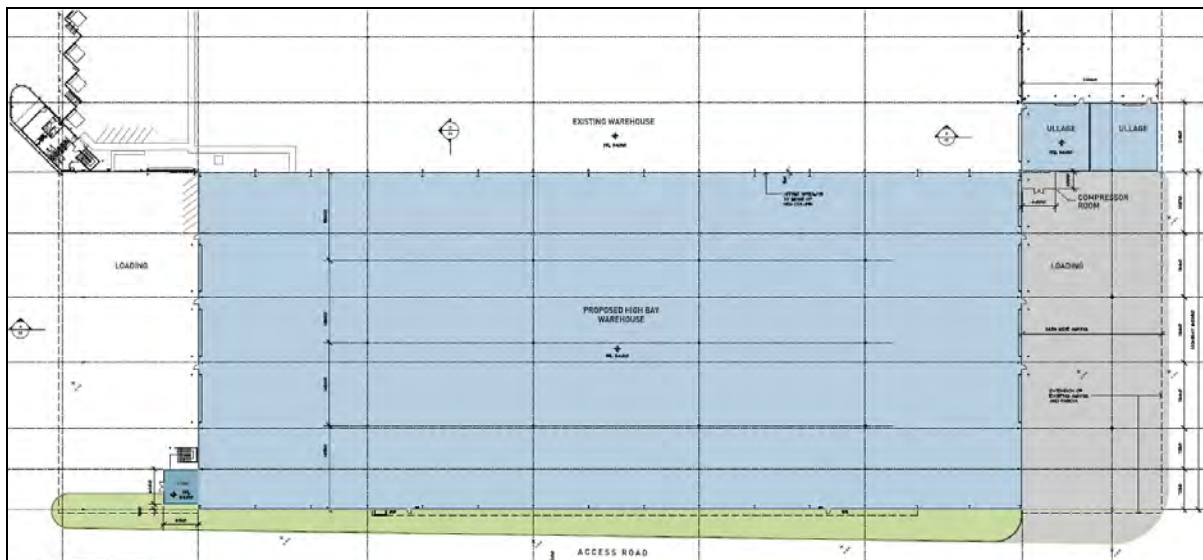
Proposed Warehouse Floor Plan – Stage 5B (Source: Giles Tribe Architects, 2012)
